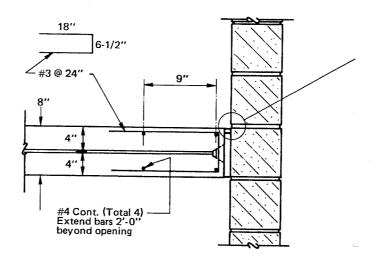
Detail of Post-Tensioned Anchorage Zone in Slab which is Separated from the Wall
